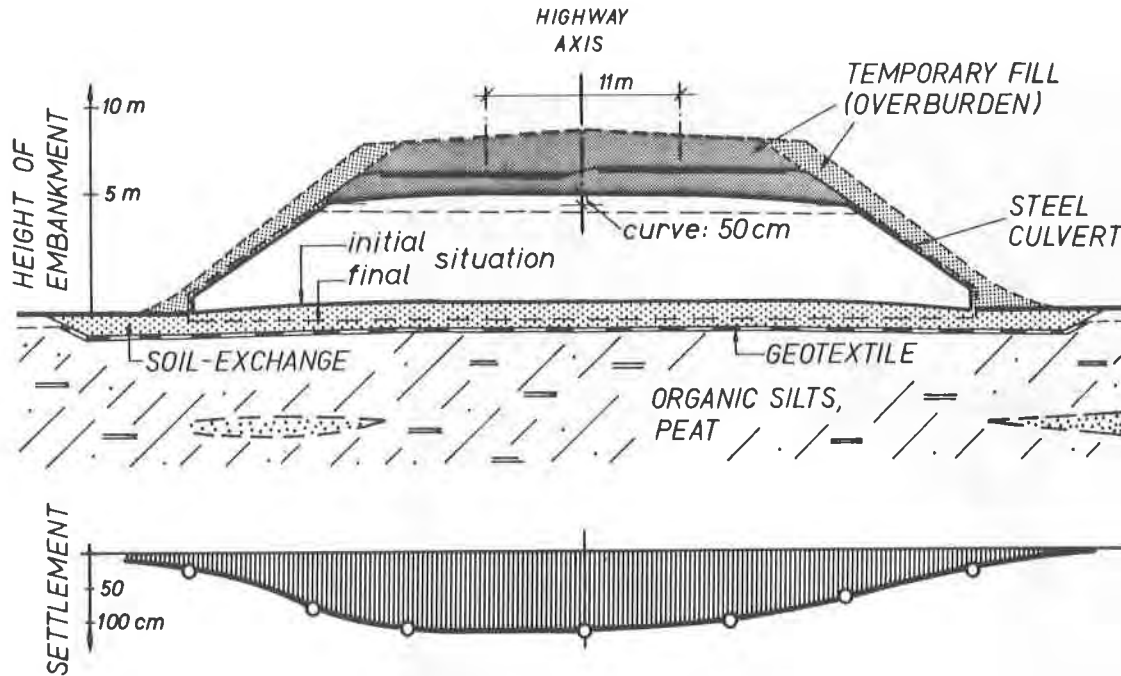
Flexible steel culvert ($d = 7$ m) on soft subsoil: originally placed in an superelevated and cambered position with a 50 cm - pitch of top - according to expected settlements; temporary overfill of the embankment (for settlement acceleration).
